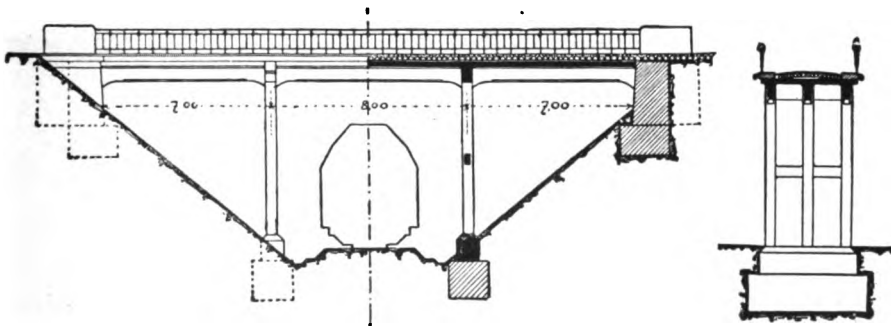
Reinforced concrete bridge over a railroad cut.
